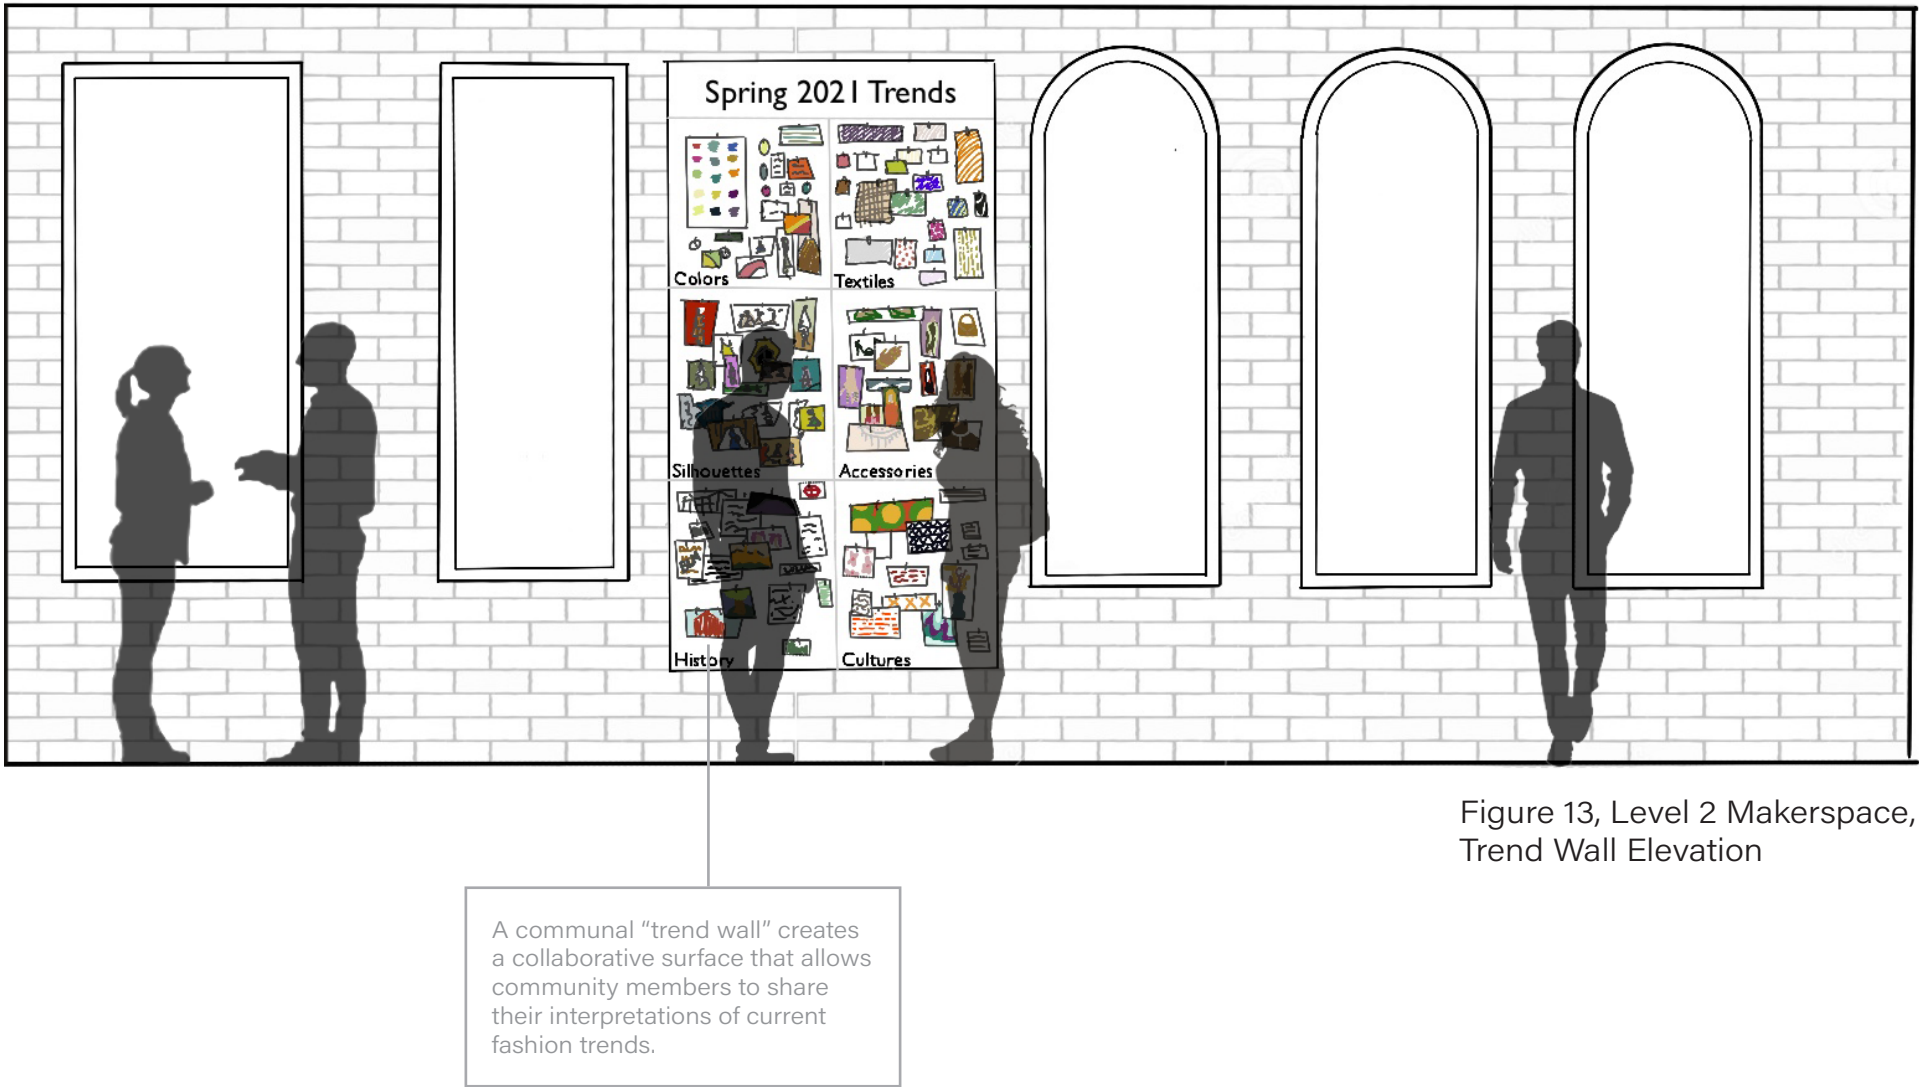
, Level 2 Makerspace, Trend Wall Elevation
